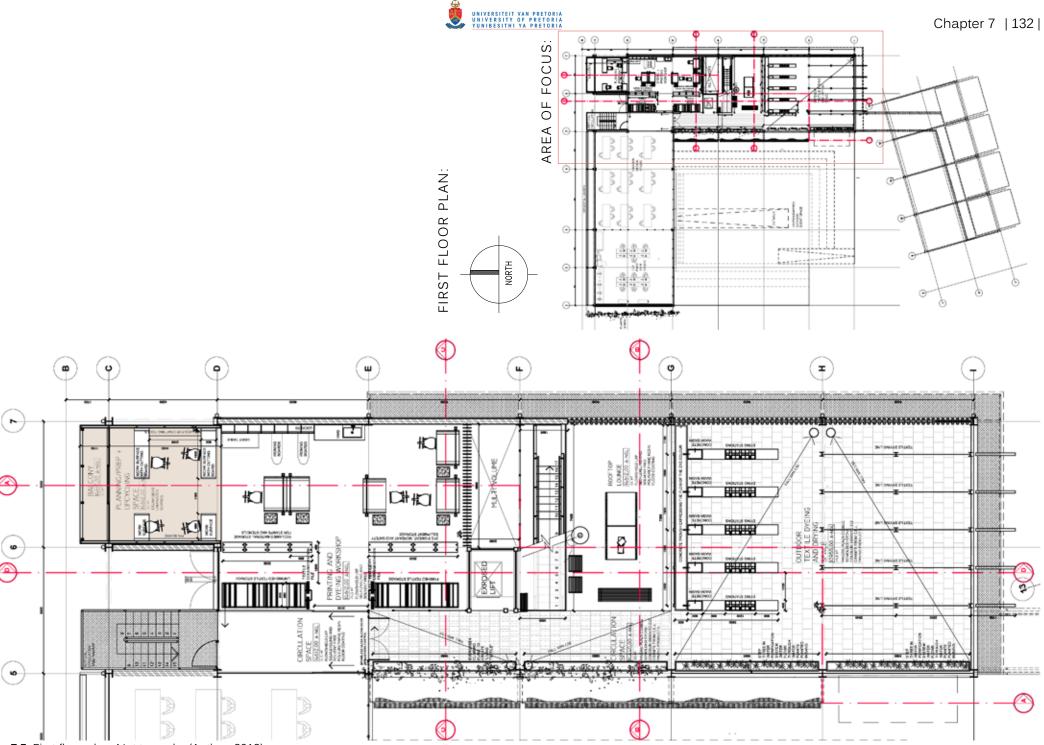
First floor plan. Not to scale. (Author, 2012)
